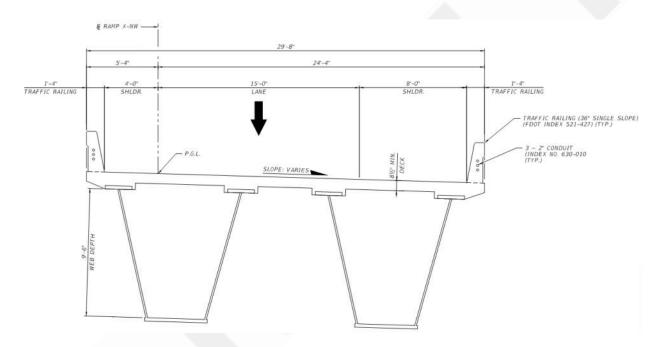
Bridge Typical Section (Bridge No. 1)
